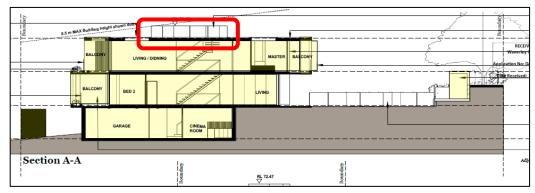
Approved section plan under DA-442/2017/C showing approved roof access to be no higher than surrounding glass balustrading (Source: Arch+Co, 2022)
